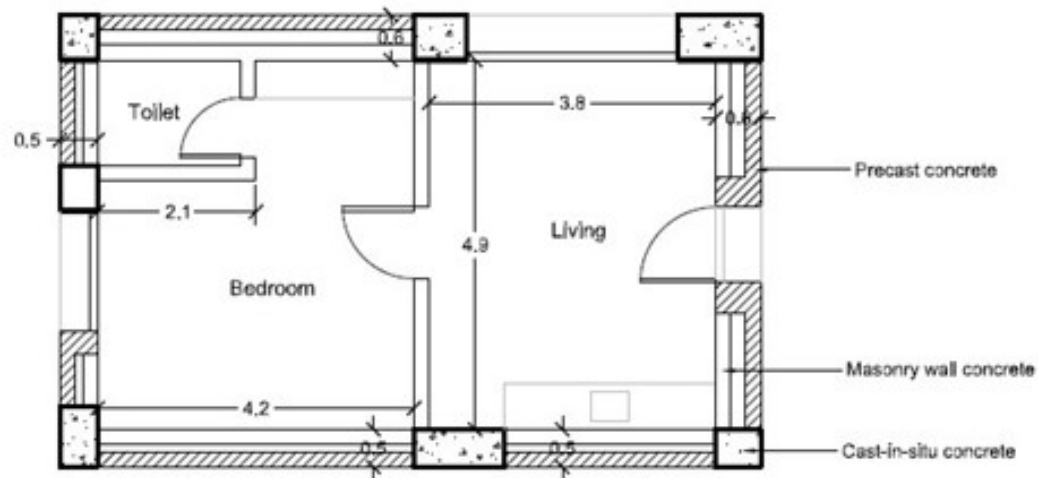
Prototype dwelling with a double-wall concrete as a building envelope (drawing is not at scale)
